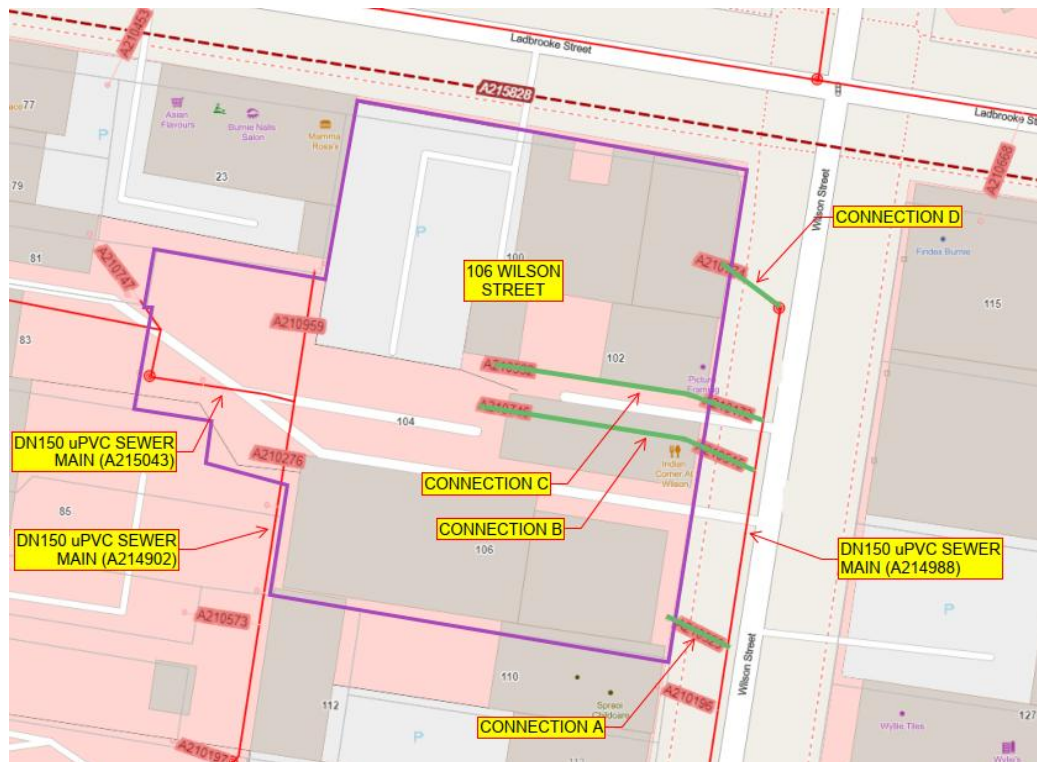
Existing TasWater sewer infrastructure and site sewer connections
